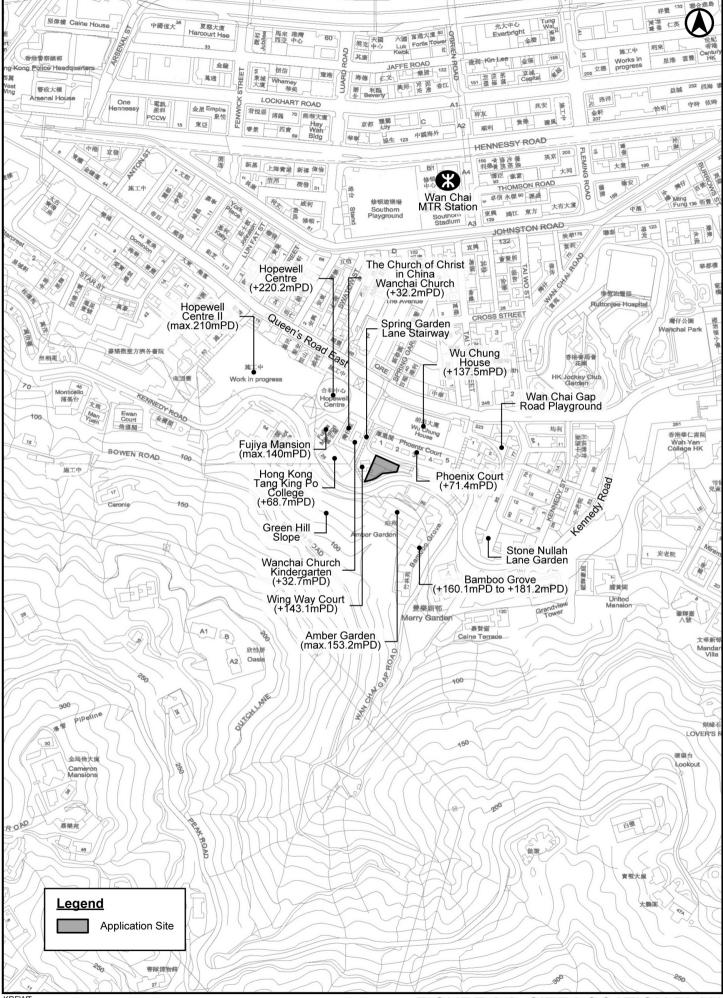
SITE LOCATION PLAN SCALE 1 : 5,000
